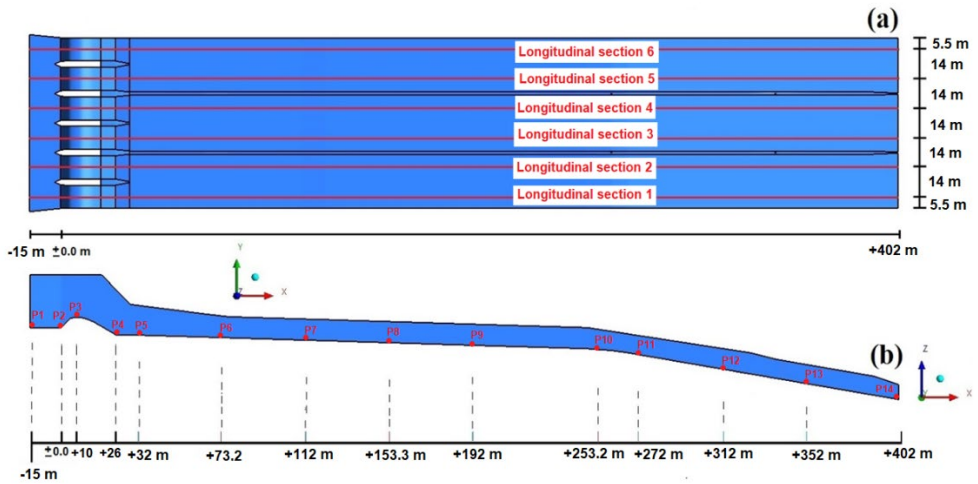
Longitudinal section points measured on the spillway model a) Spillway plan section b) Spillway longitudinal section
